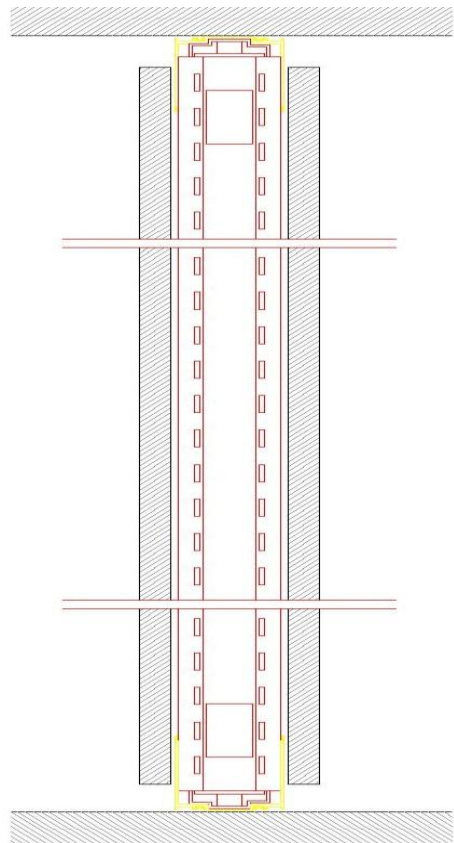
Junctions for wall panel with Floor and ceiling with the structure
